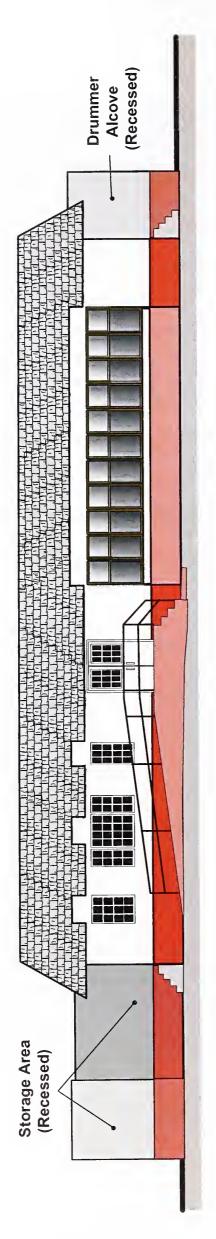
Sketch of the north side of The Station nightclub locating the main entrance, front stairway/ramp, windows in the main bar area (left), sunroom/pool room (right), and exit stairs from the east and west sides
